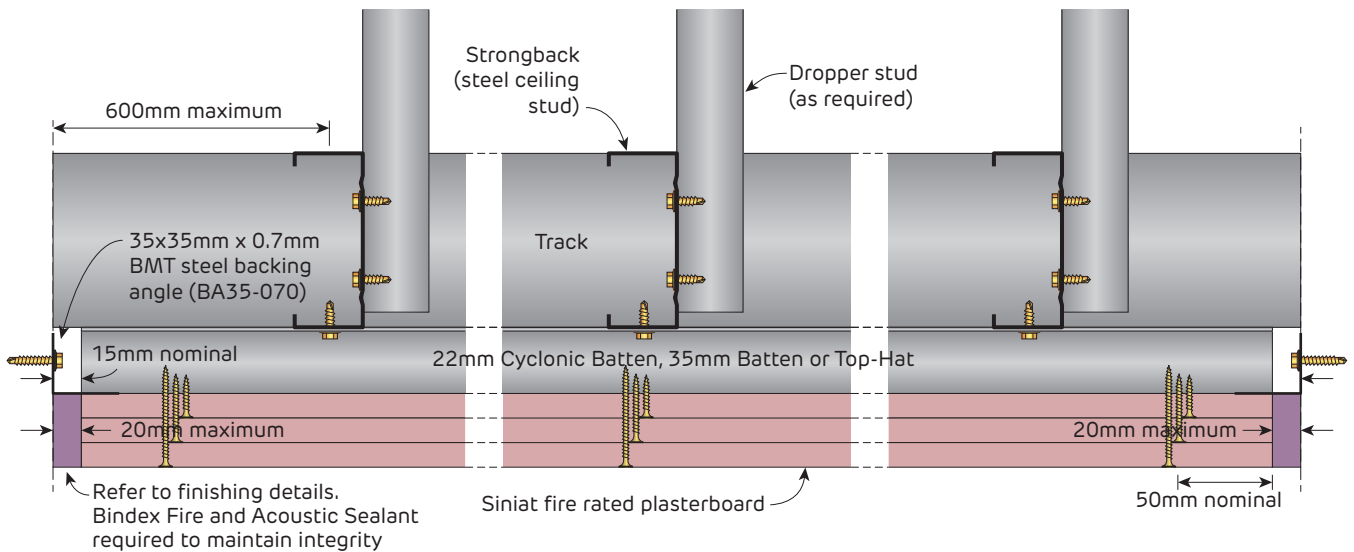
Stud Ceiling Type C2 - 2-way Plenum Braced
